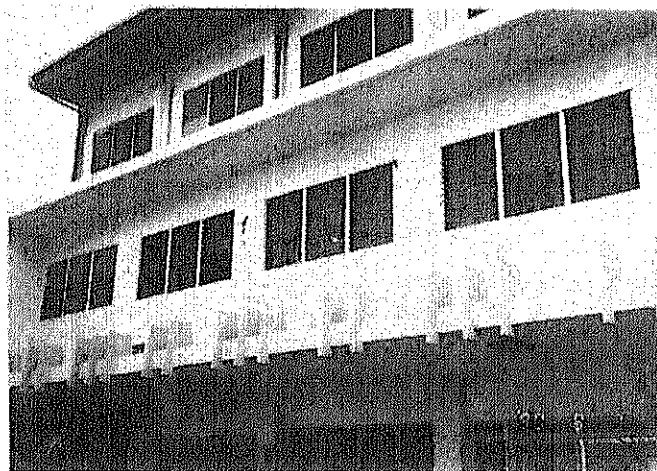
Cracks in wall of Vilmar Hotel
